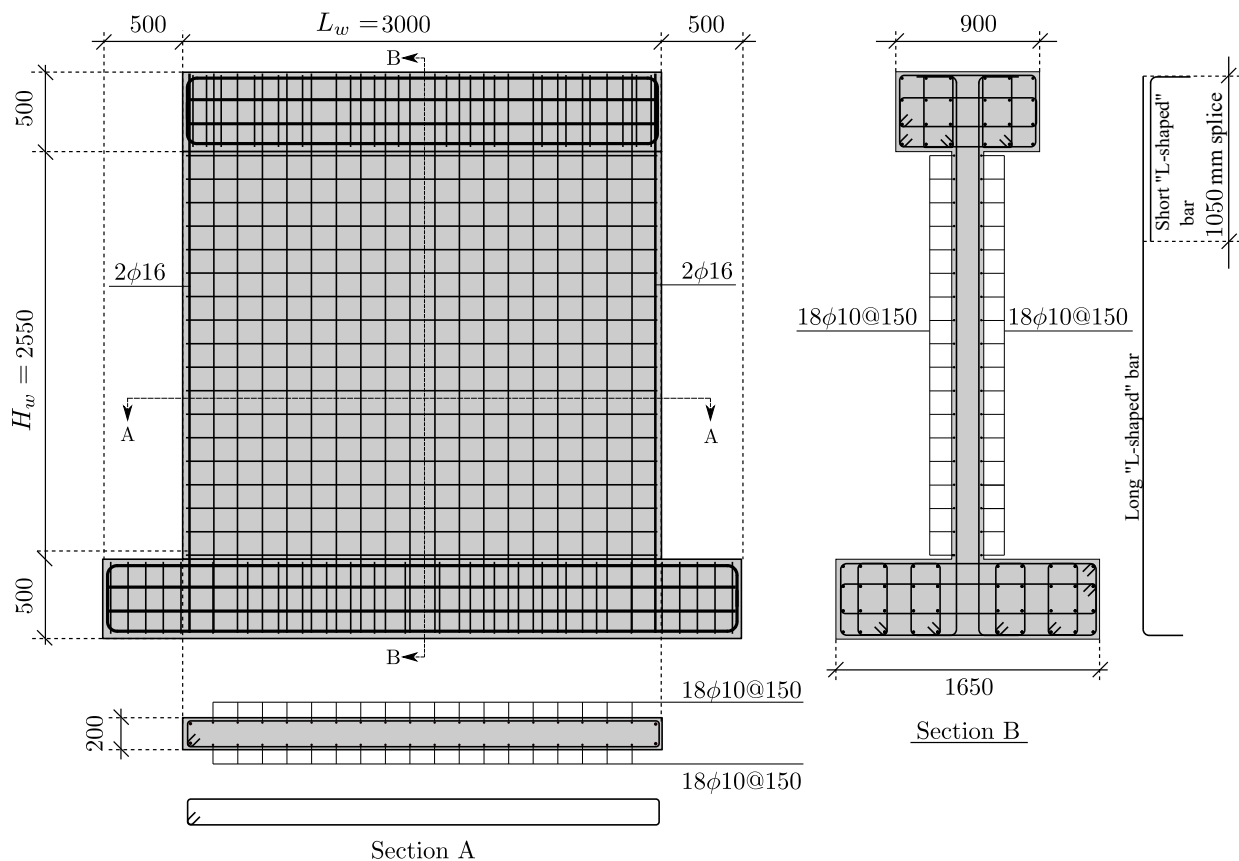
Specimen reinforcement and geometry of specimens SW01, SW02, HSW01 and HSW02.
